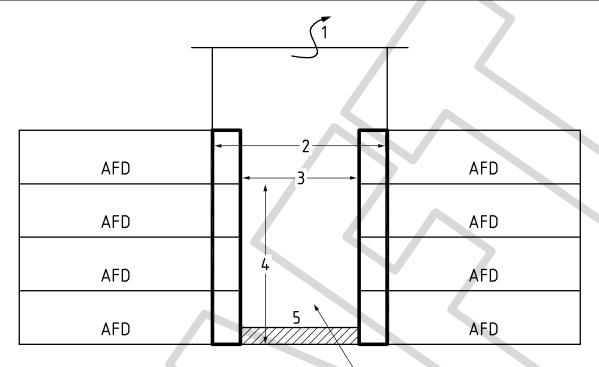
Exemplar 4: Top floor less than 11 m without sprinkler protection
